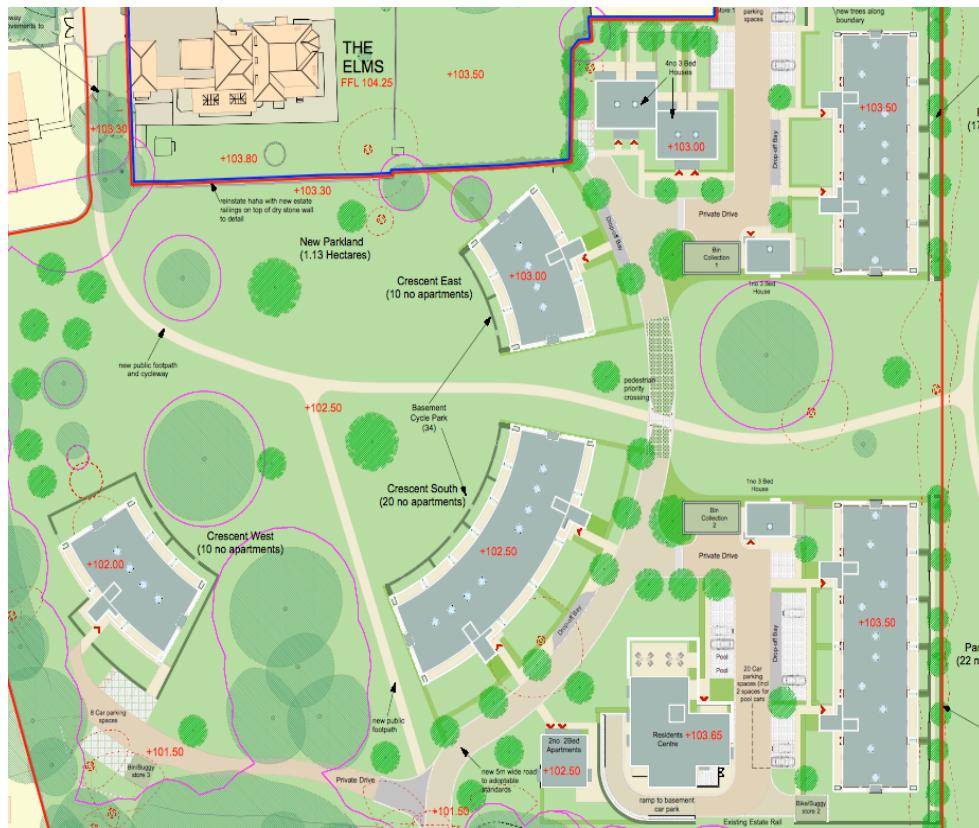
Extract of Proposed Site Plan (Plan No. 1981-112 Rev. A)
